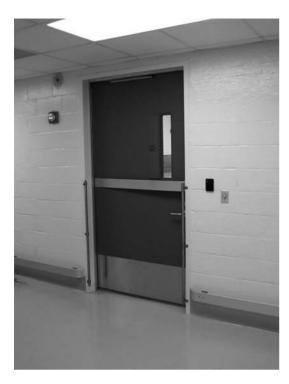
Picture of an animal facility corridor illustrating guard rails installed approximately 6" off the floor. Note also the crash rail on the door and the vertical door-frame guards.
